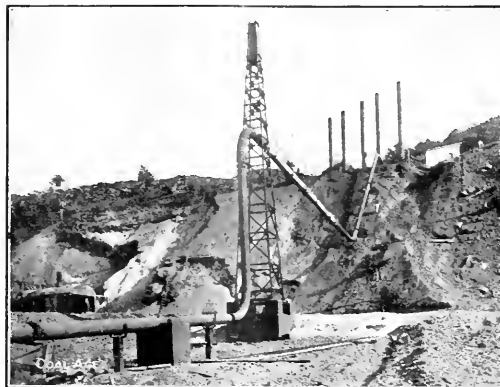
POWER PLANT AND CONSTRUCTION ON STEEP HILLSIDE
